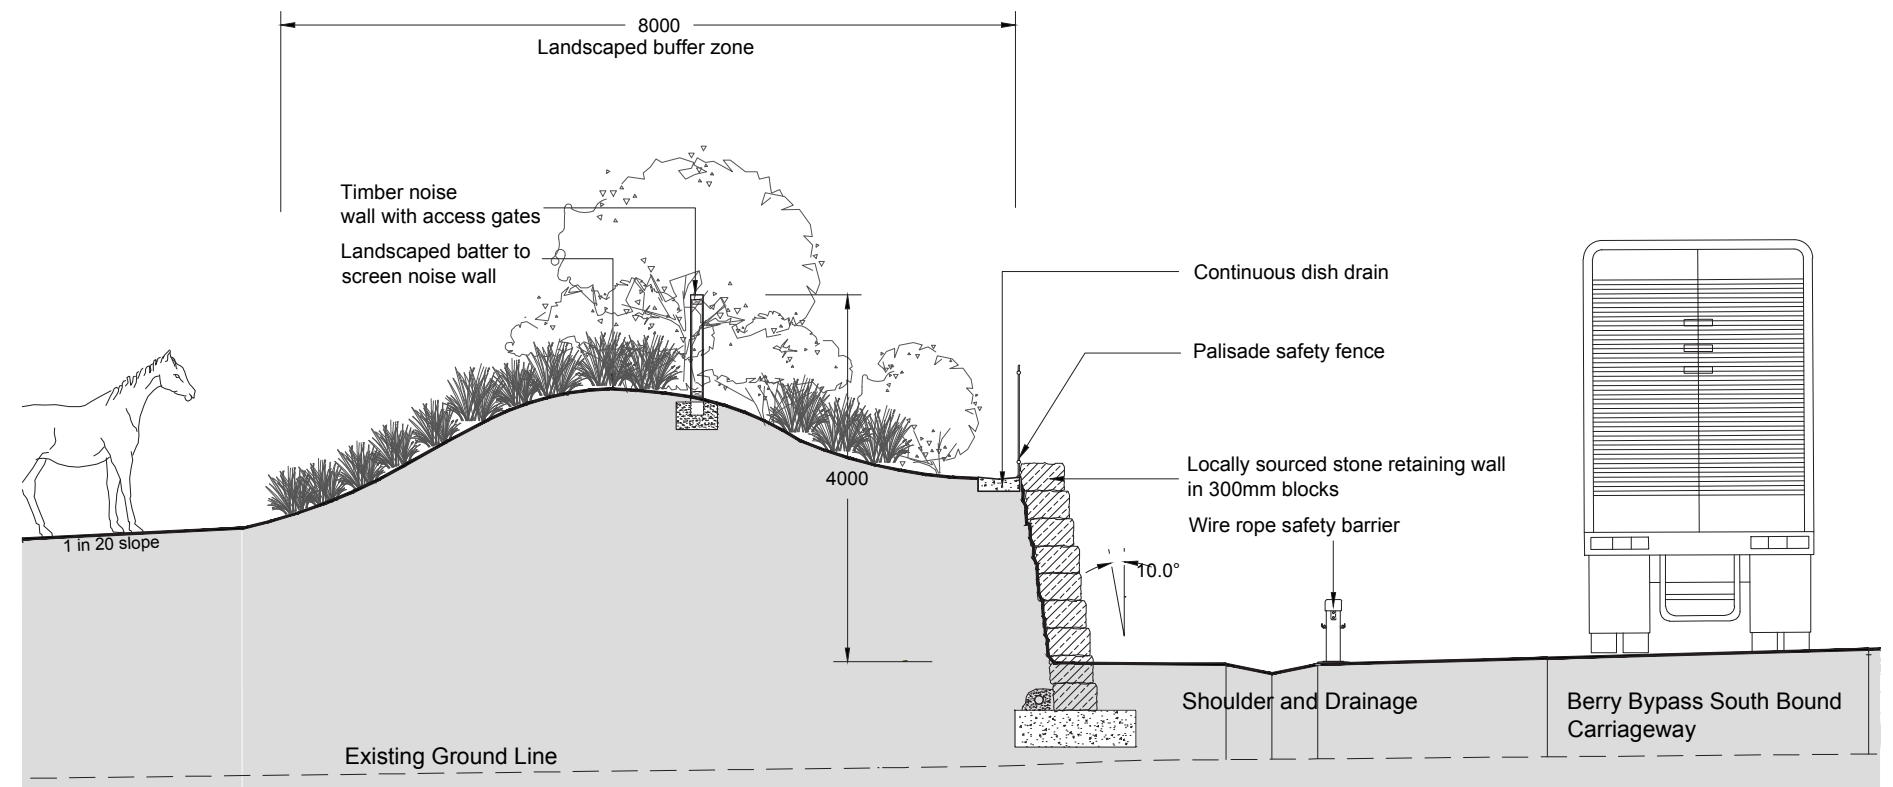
Noise barrier option 3 - combined stone wall and timber fence typical cross section.
